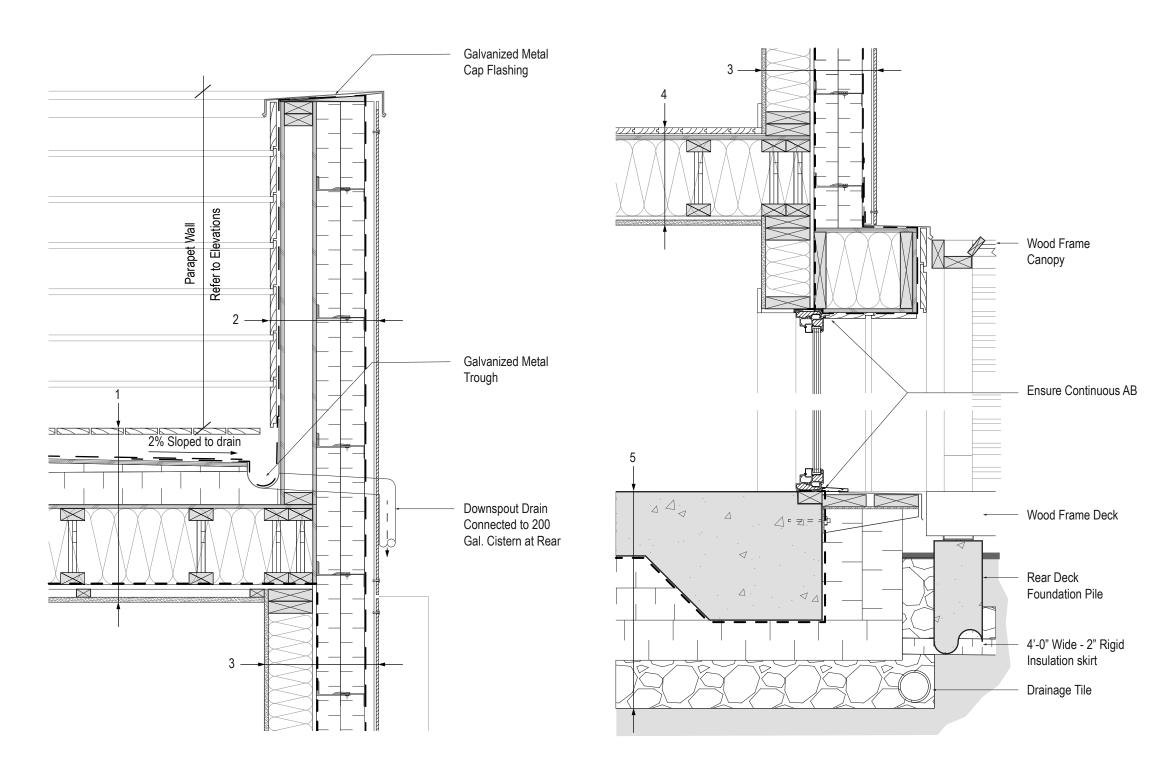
Terrace Door Sill & Top Plate Scale: 1" = 1'-0"
